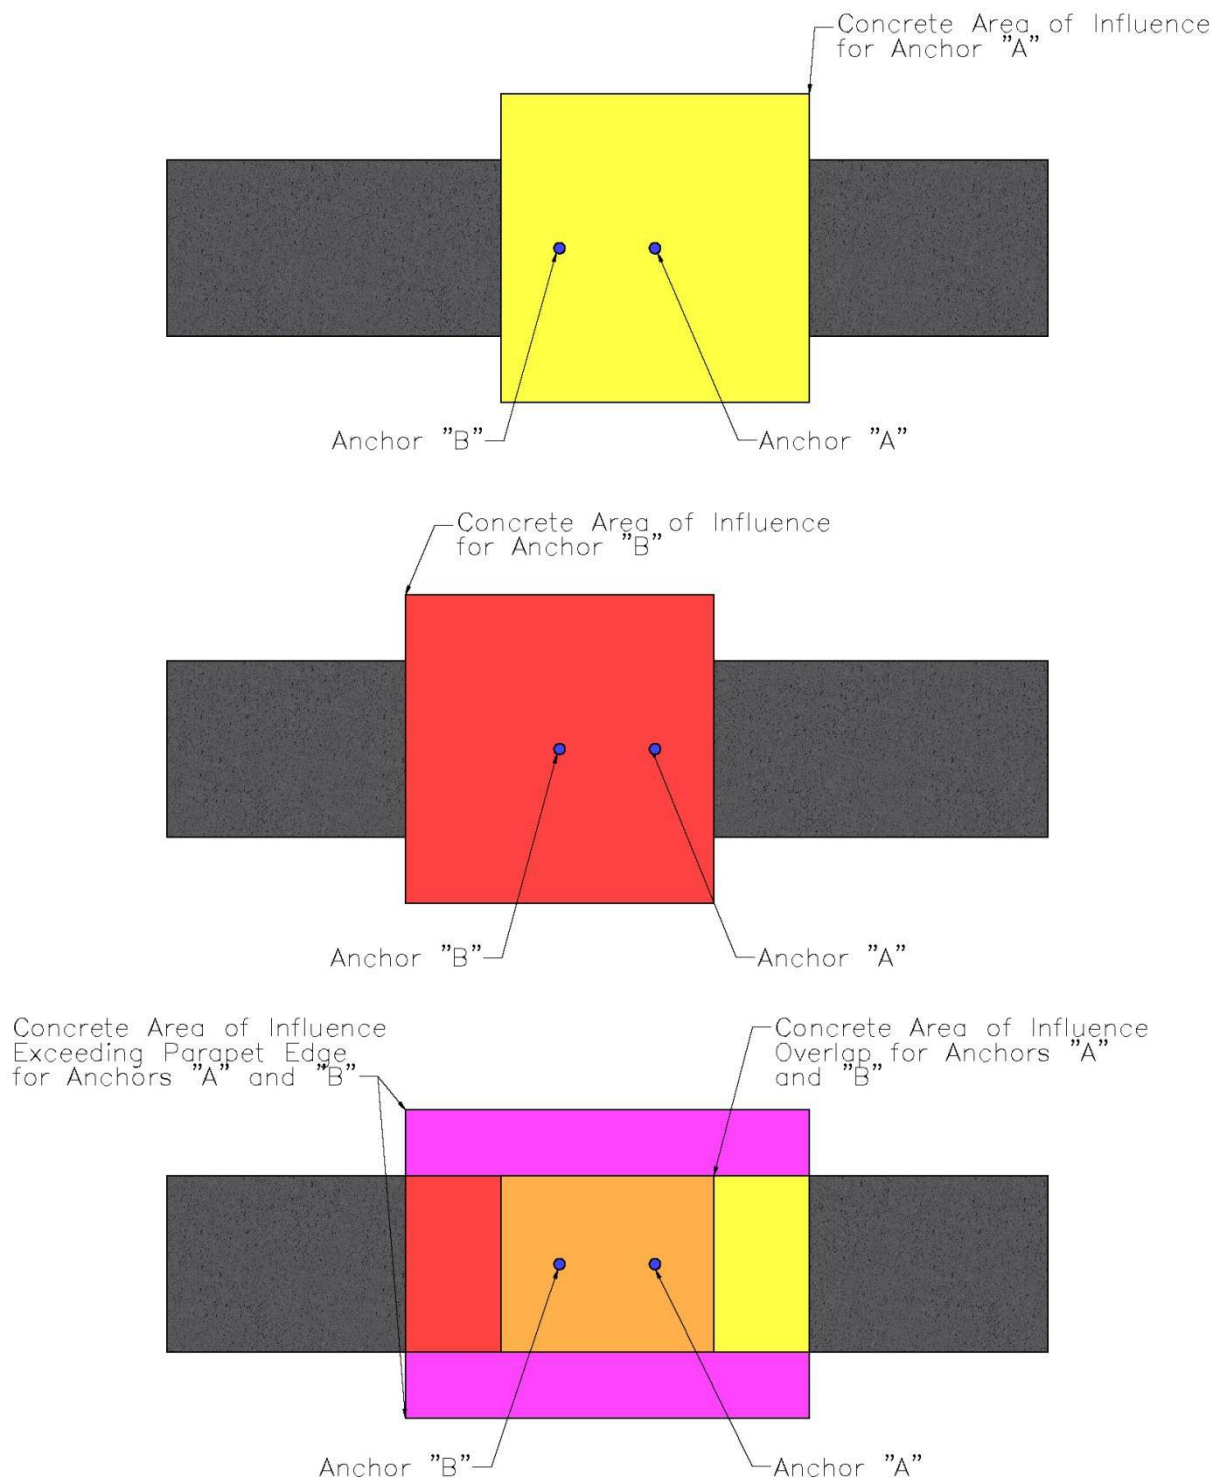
Concrete Area of Influence for Two Adjacent Anchors on Concrete Parapet [49]
